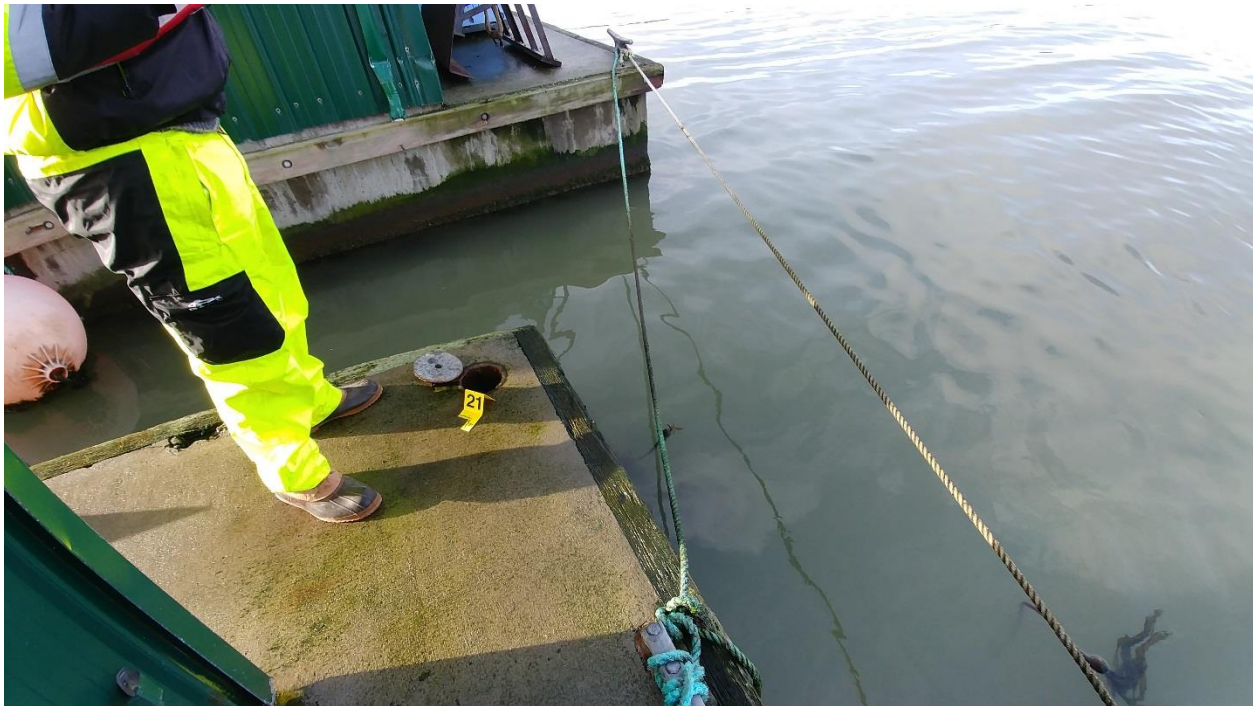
Anchor #21, NW Corner of the Main Barge. Part of an Anchor Bridle System.
